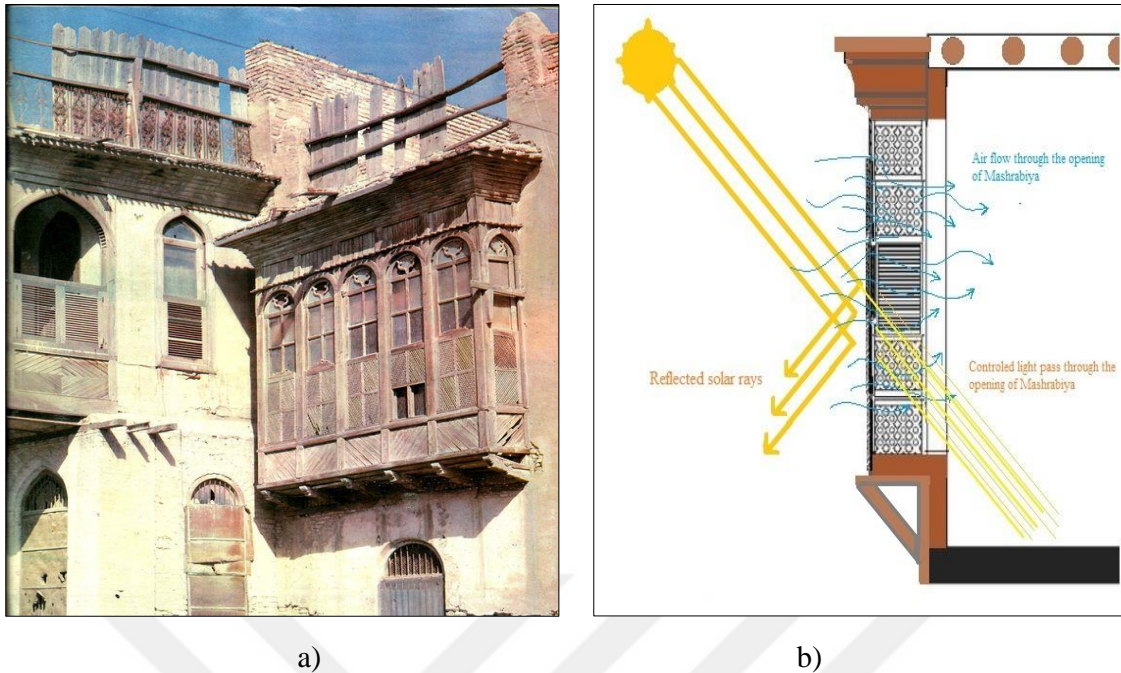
(a) Mashrabiya of traditional house (b) Details drawing by author
